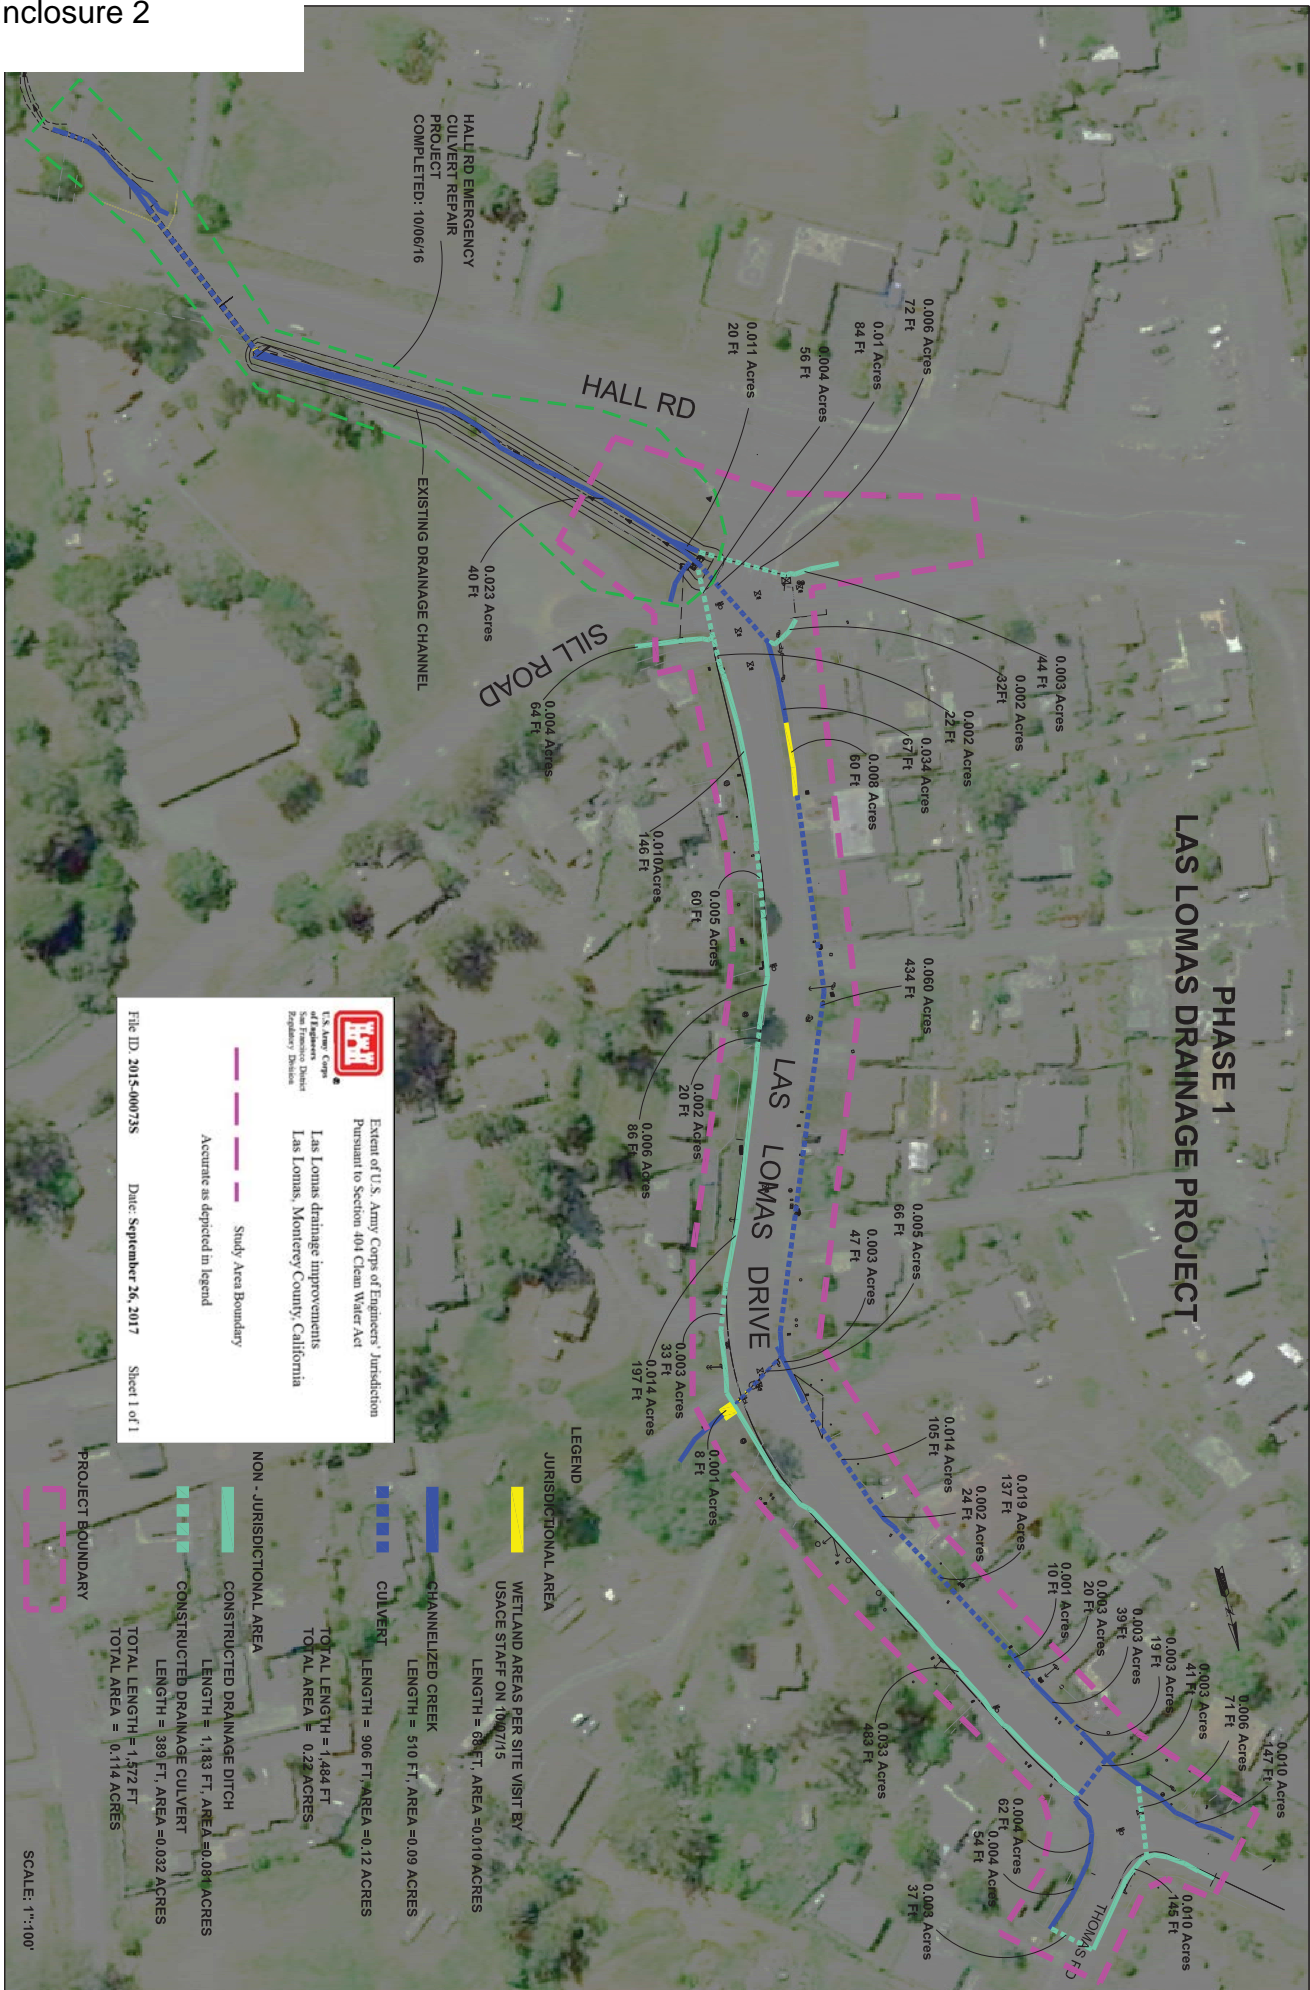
EXHIBIT PROVIDED BY CREEGAN +D'ANGELO ENGINEERS
